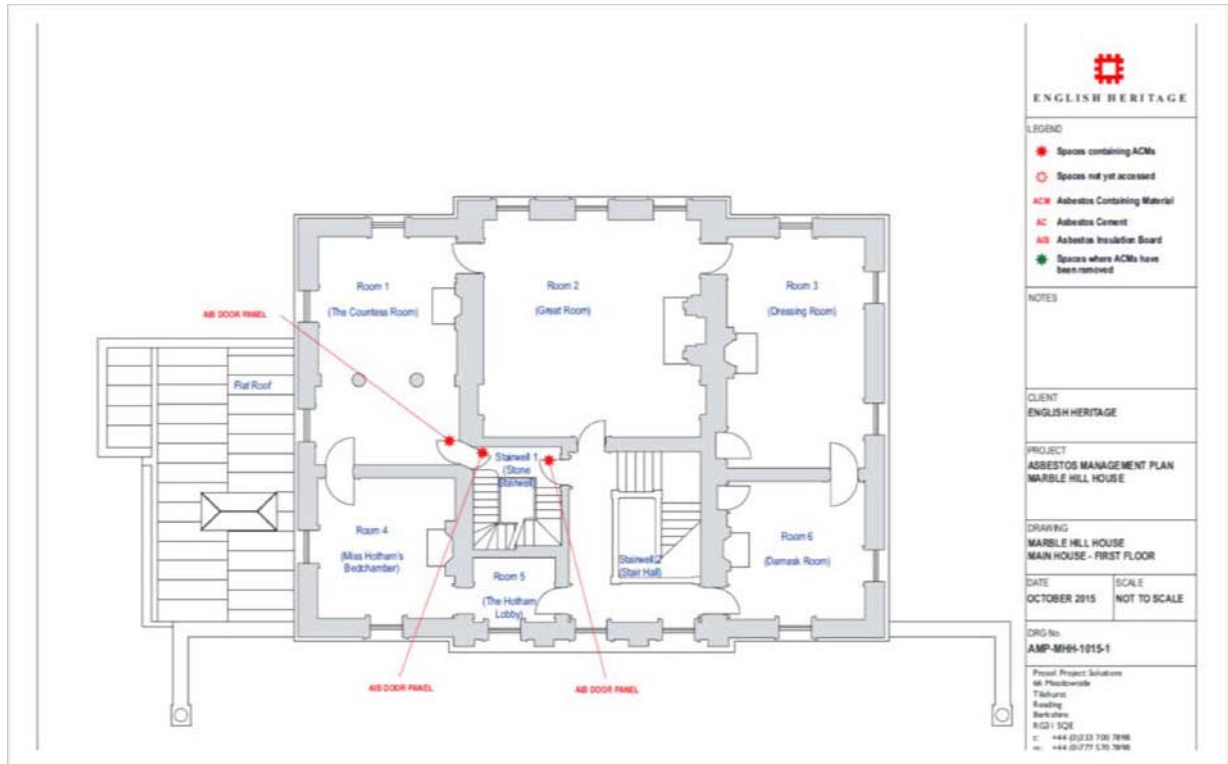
First Floor Plan, showing doors with existing asbestos panels.
